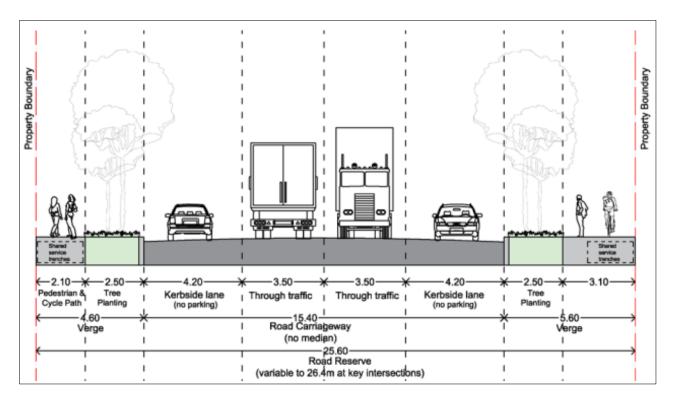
Mamre Road DCP Typical Industrial Local Road (Source: Mamre Road DCP 2021)
